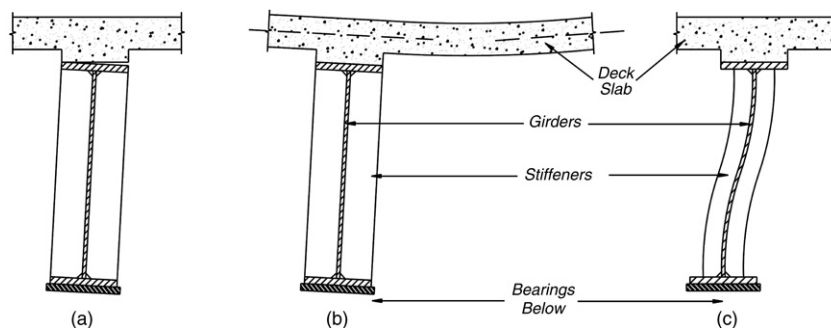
Transversely deformed girder ends with (a) rotationally flexible connections at top and bottom of girders and (b) flexure in the end of the deck slab and (c) full fixity at top and bottom of girder.
